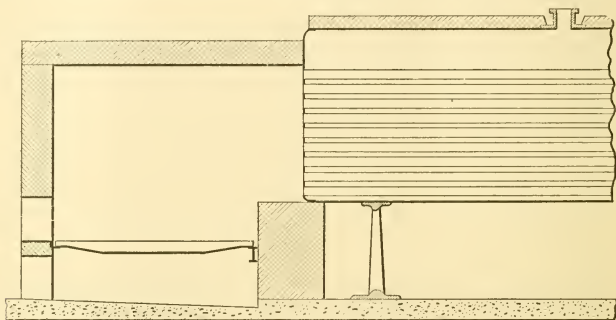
SETTING OF A FIRE-TUBE BOILER IN WHICH THE TUBES LEAKE
